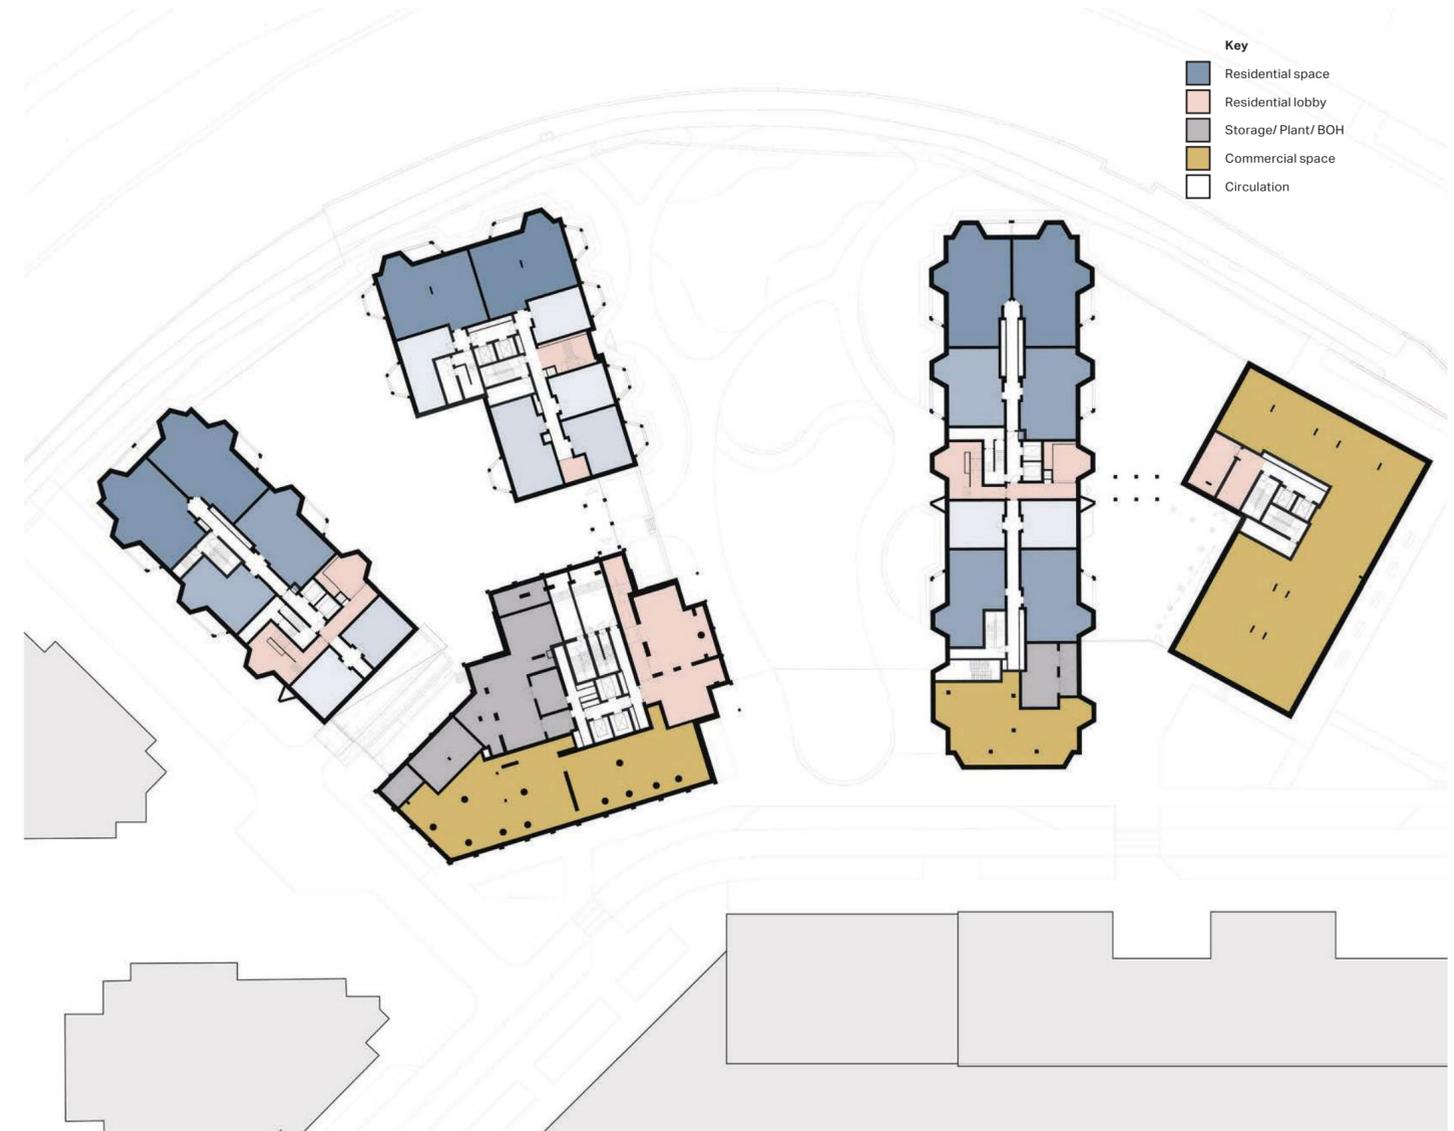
Plot 04 - Raised Ground Floor plan showing indicative internal arrangement
